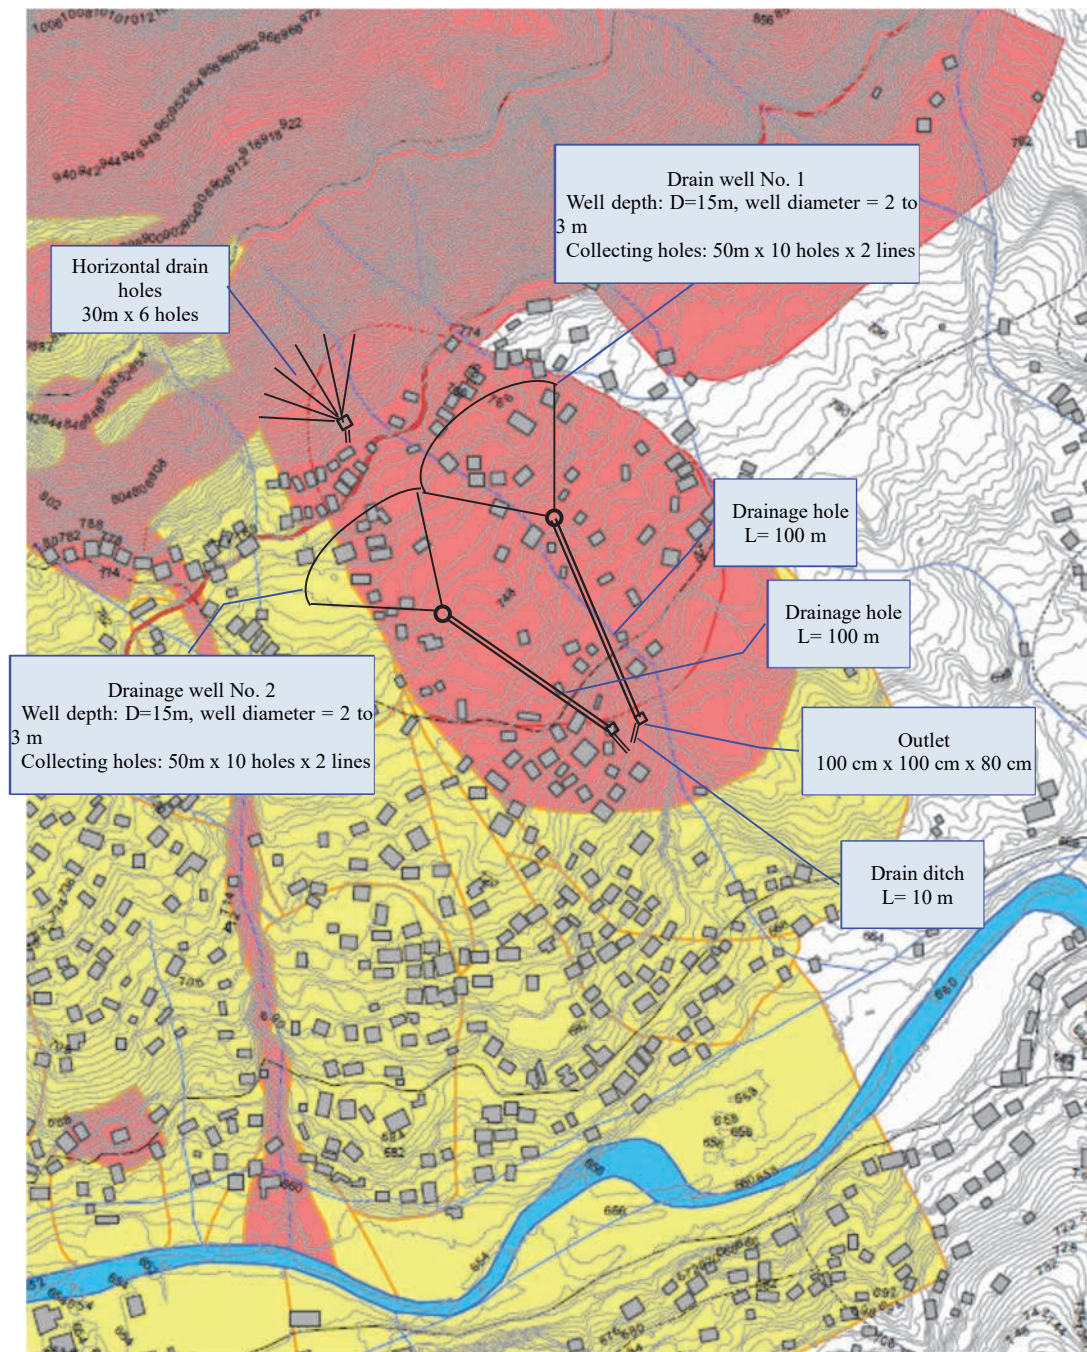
Layout of the Planned Structural Measures for Site 4 in the Weeriyapura Pilot Site
